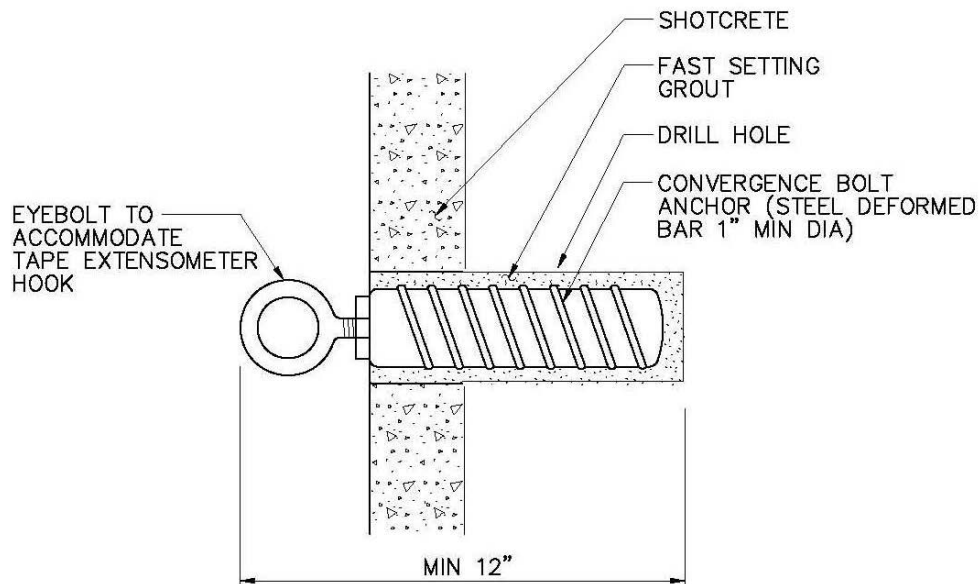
Typical Convergence Bolt Installation Arrangement
